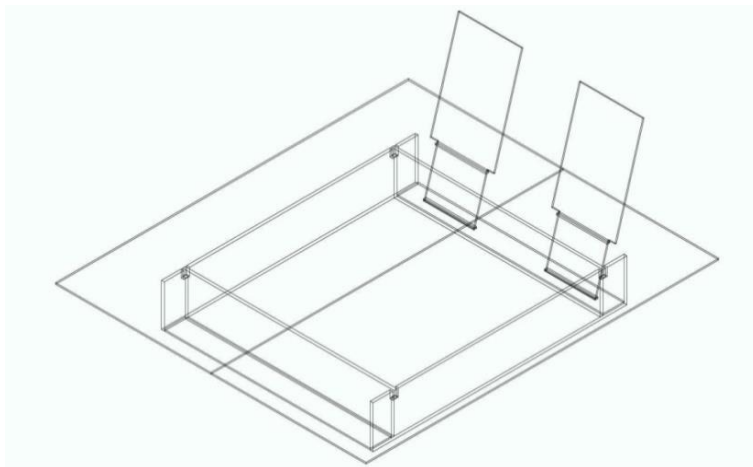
Wall-hung glass toilet. Faceted glass walls.
